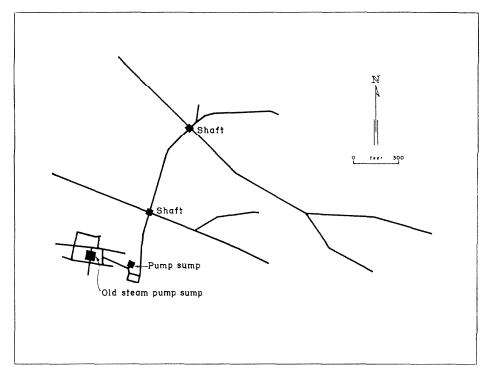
Plan of tunnel system at shaft 5, McBryde Sugar Co. pump 2,
